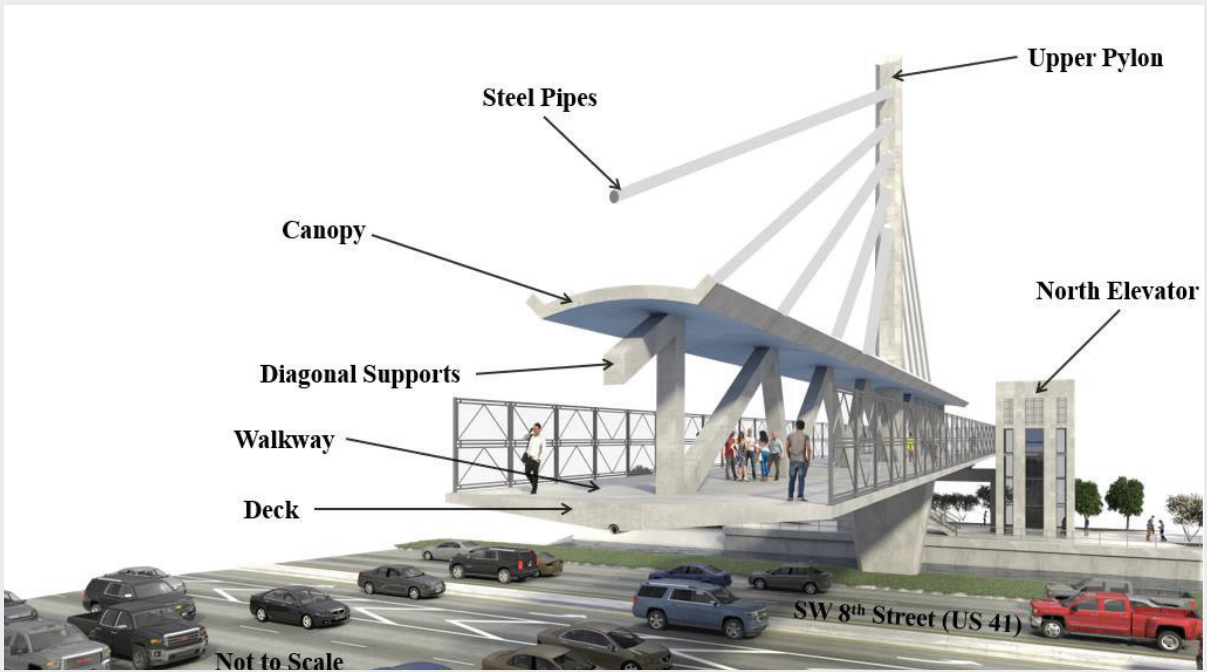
Rendering of what the cross section of the pedestrian bridge would look like when completed, looking to the northwest (Source: NTSB Factual Report)
